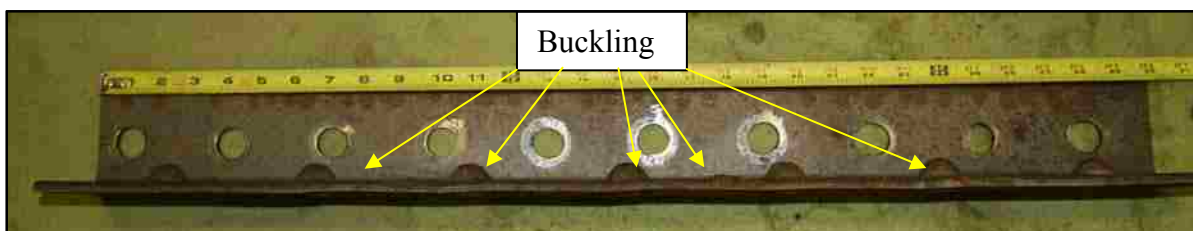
West Guardrail Hole Deformation - Specimen 7R
